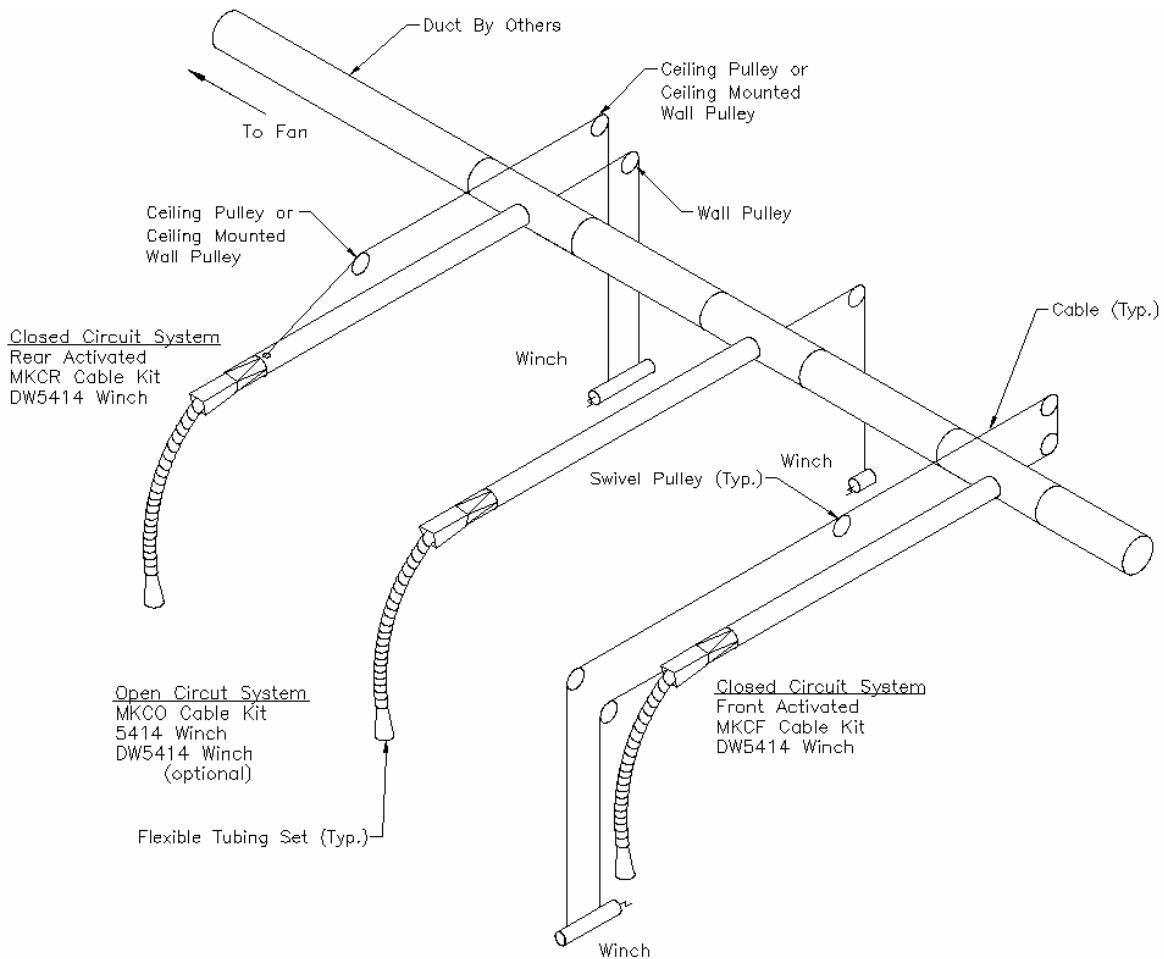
OVERHEAD DISAPPEARING LAYOUT OPTIONS
